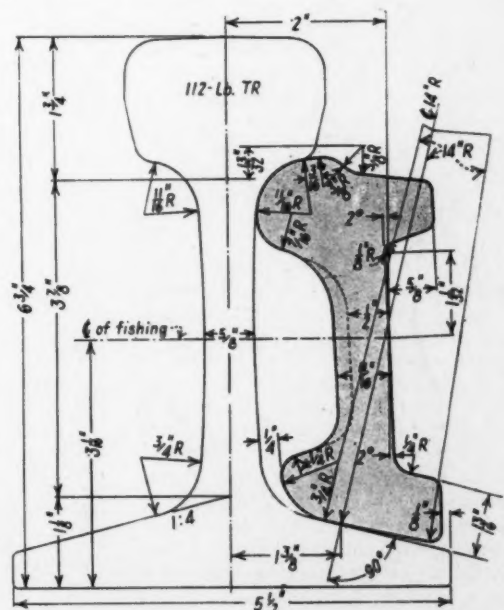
Right—Shaded Area Shows Cross Section of New KMS Joint Bar Applied to 112-lb. TR Rail
